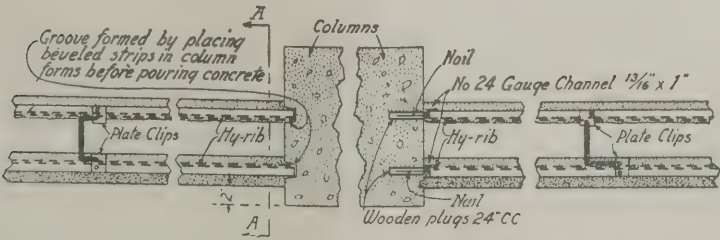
DETAIL OF SHED FOR MIDLAND RAILWAY CONSTRUCTED WITH "HY-RIB."
